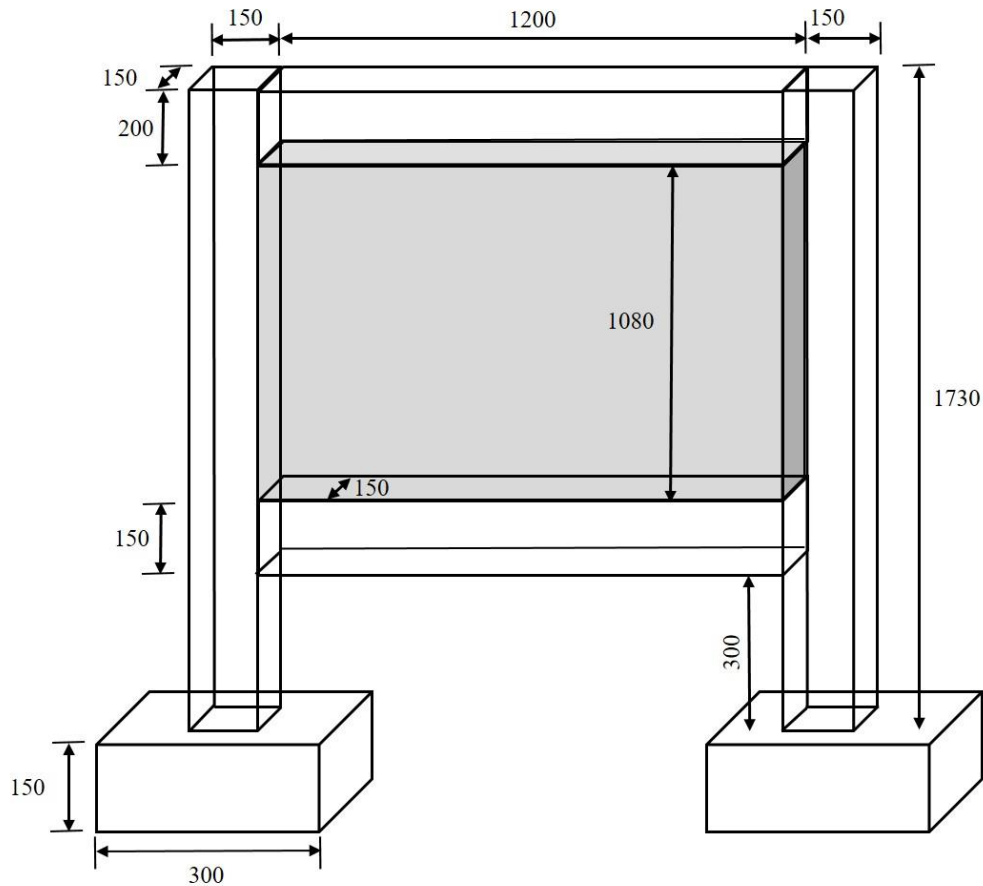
34: 2D frame with CSP as infill (all dimensions are in mm)
